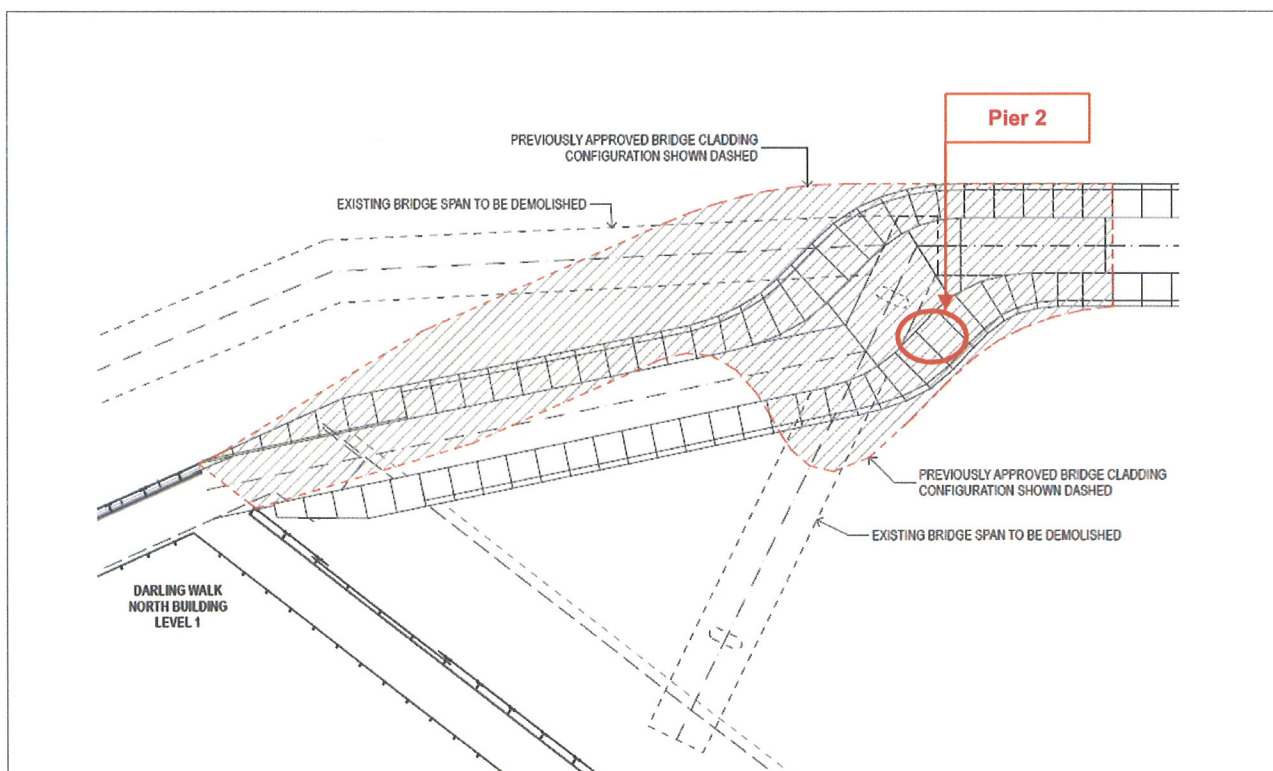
Proposed realignment of the footbridge (western end of footbridge)
